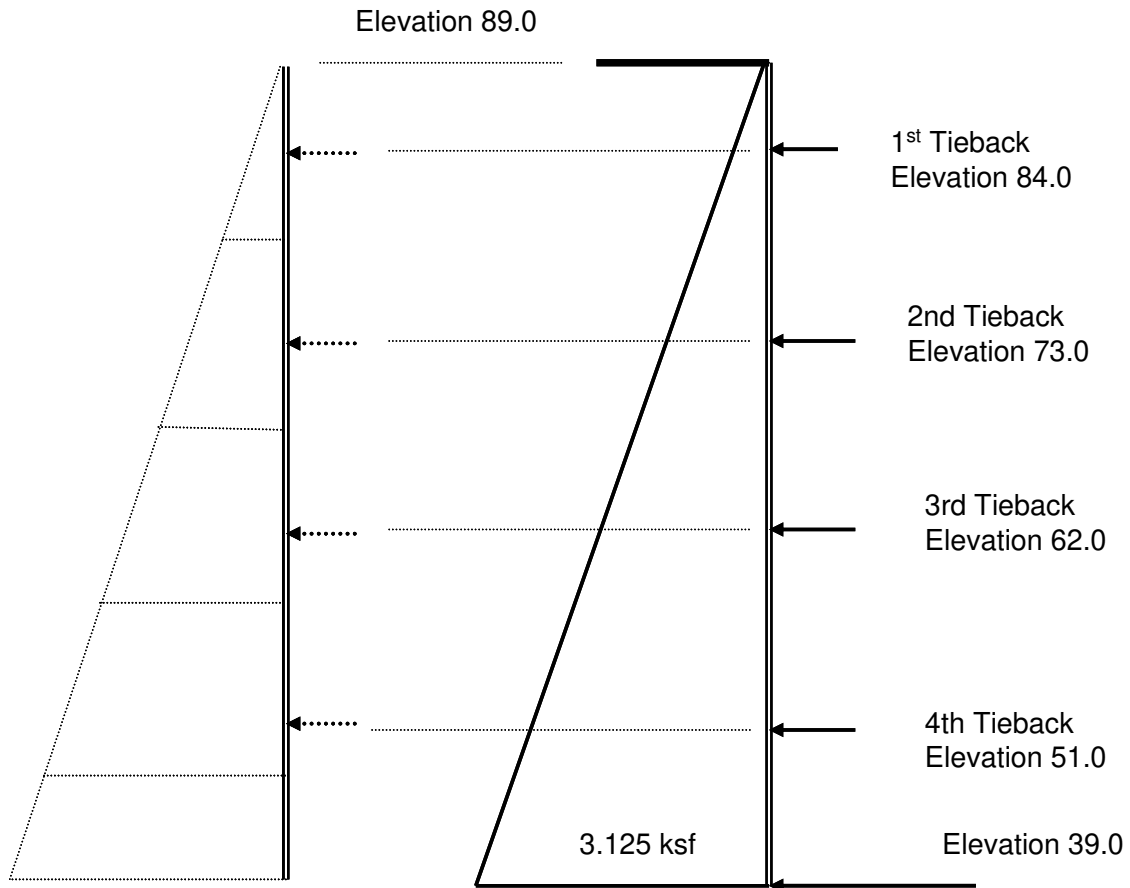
Excavate to elevation 39.0 – fifth stage excavation
